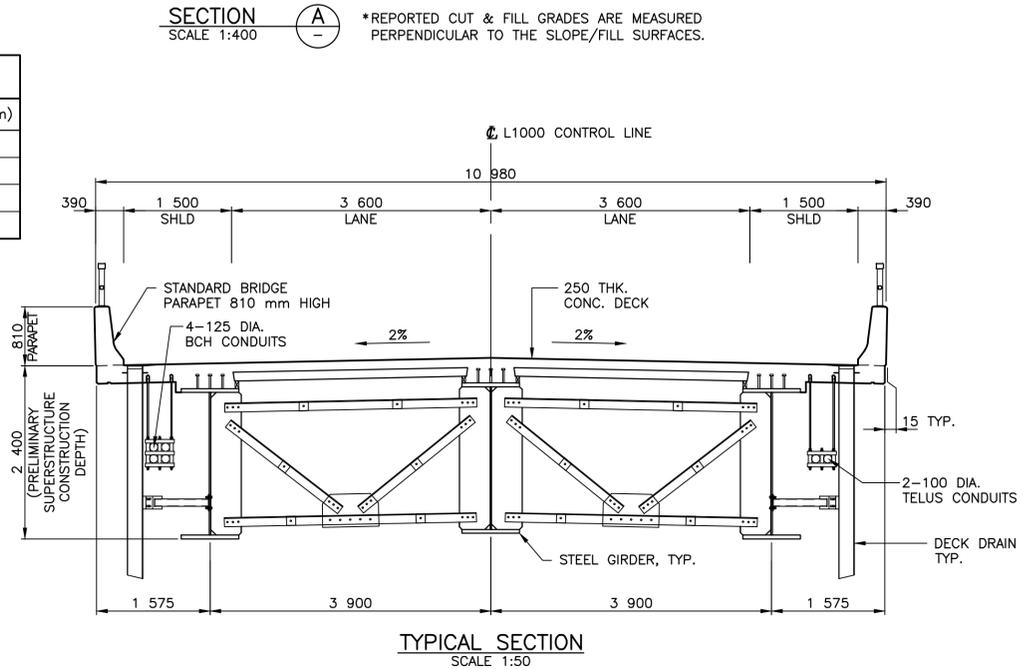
General arrangement of Highway 29 realignment segment at Lynx Creek, per proposed revised bridge design (proposed Figure 4.28 Rev 1)
